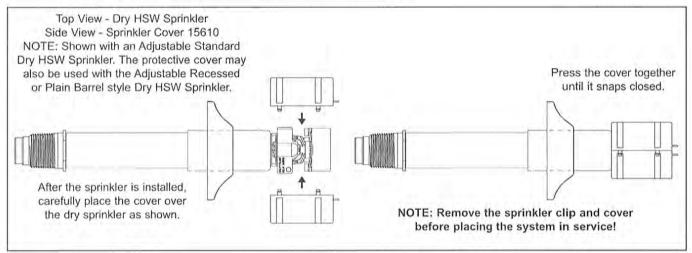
Dry Horizontal Sidewall Sprinkler Cover Part Number 15610 (shown with an Adjustable Standard Dry HSW Sprinkler) (Optional for temporary use with Viking Dry HSW Sprinklers until finish work is completed around the sprinkler.)
